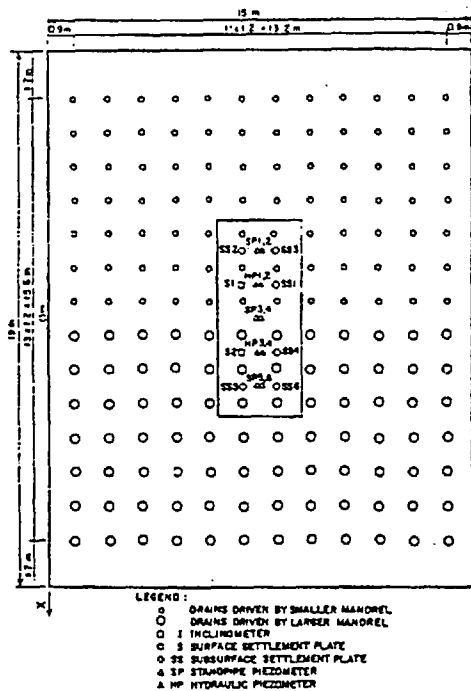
Plan view of embankment on prefabricated Alidrains.
